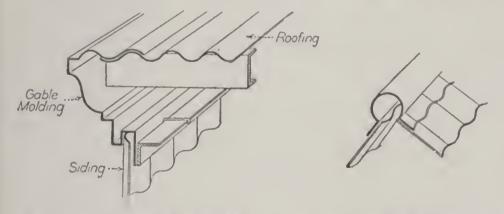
Joining a Gable Molding to Corrugated Roof. Fig. 233. Ridge Finish, Showing Ridge Roll.
